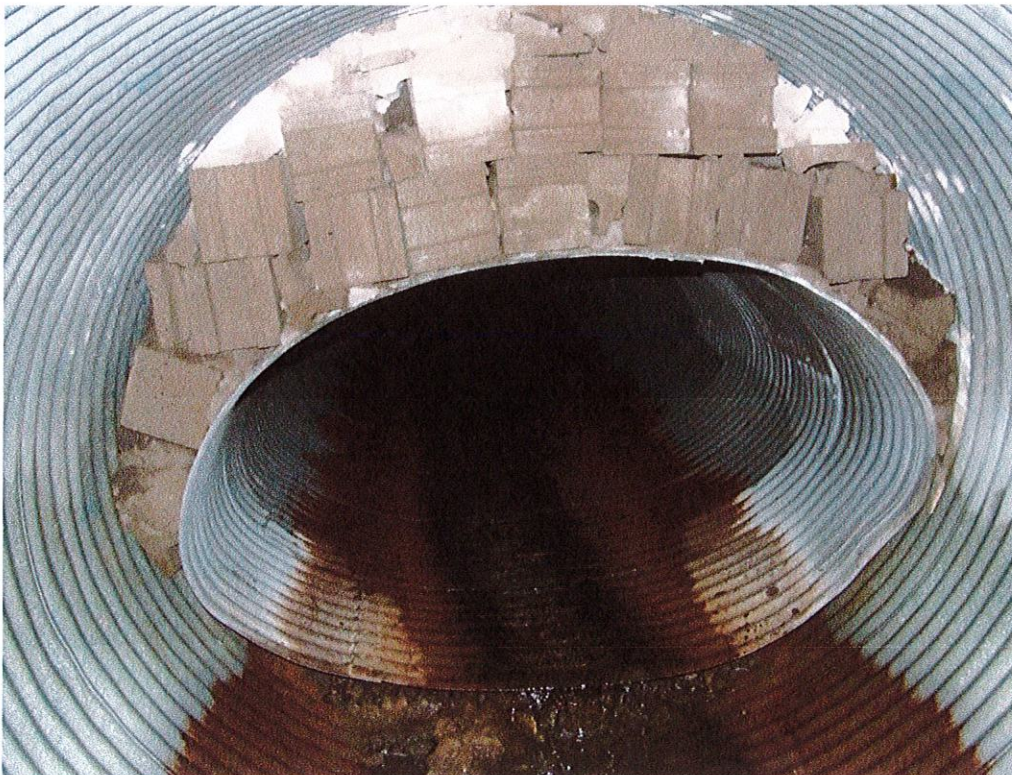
Transition from section 3 to 4. Erosion noted through masonry infill
